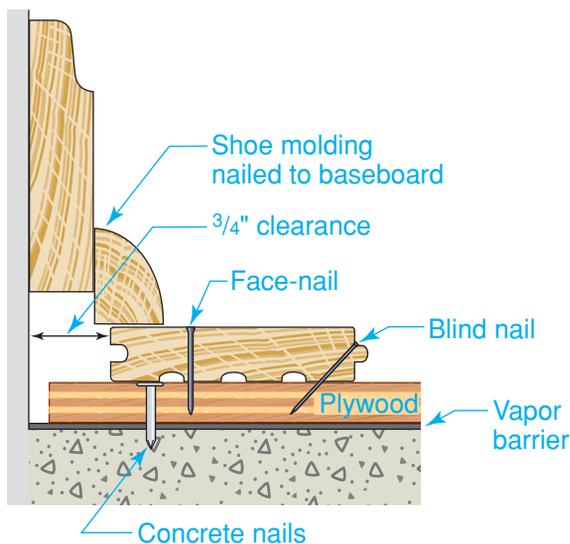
Fitting Flooring over Plywood Using Plywood Plywood can also serve as a base for installing wood flooring over concrete. Note the use of concrete nails.
